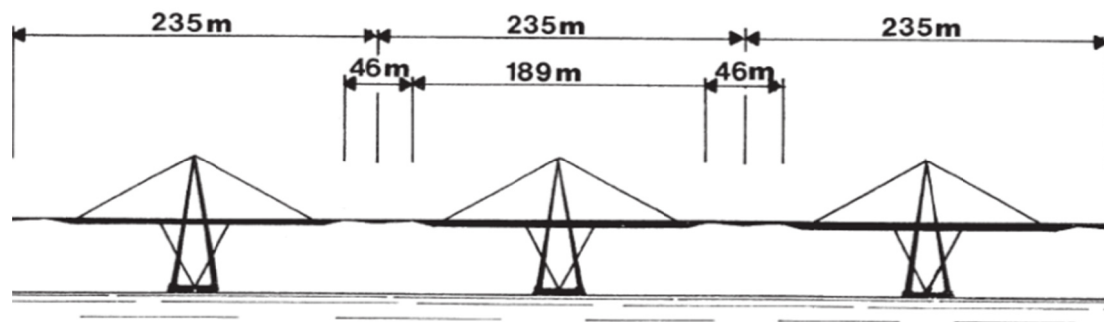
The Maracaibo Bridge: longitudinal view of the typical 235 main spans carried by a cable stayed structure, repeated for totally five spans across the entire bridge
